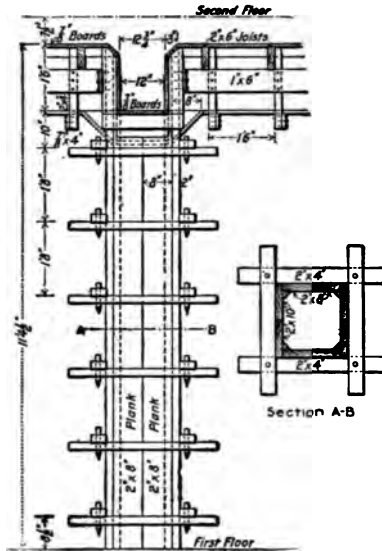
Girder and Column Form for Minneapolis Warehouse.
